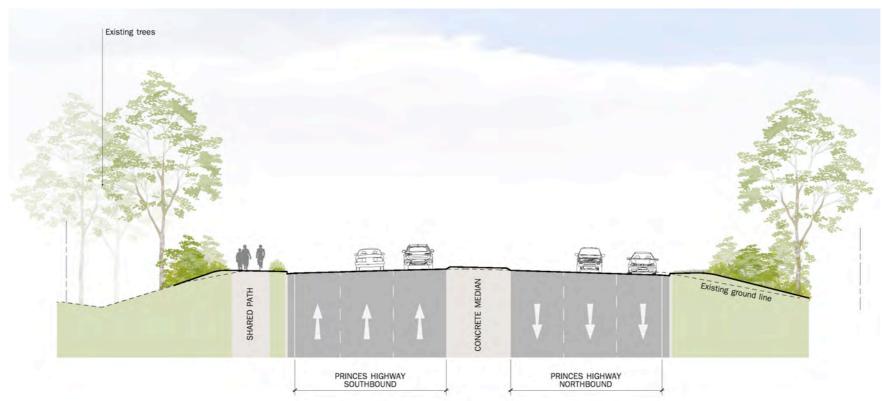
Section 7 through the Princes Highway - Chainage 78080 (Scale 1:250)
